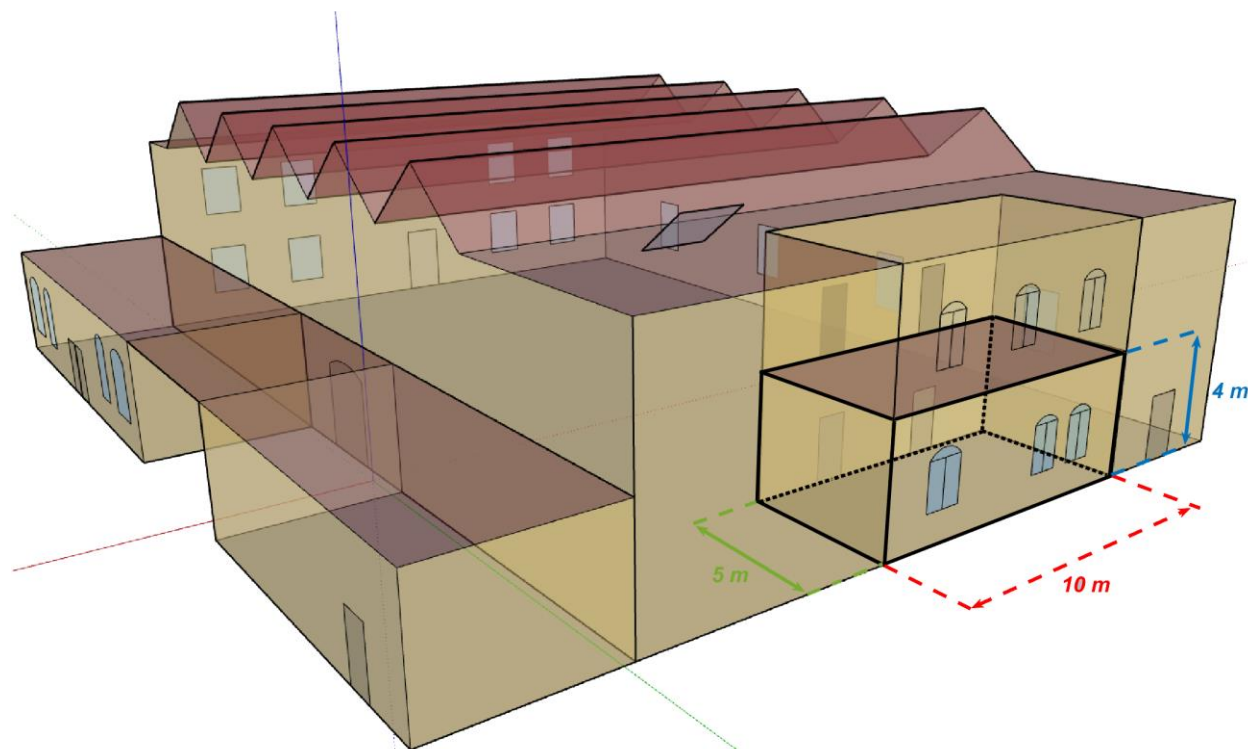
Heating space (thermal zone 1, 1st floor office) Highlighted
